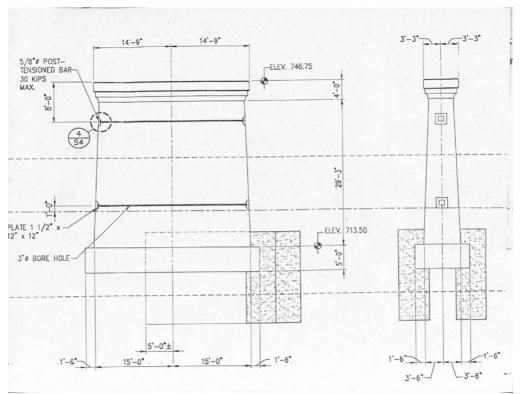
Jet grouting details for the repair of the scour damage, from US-80 construction documents
